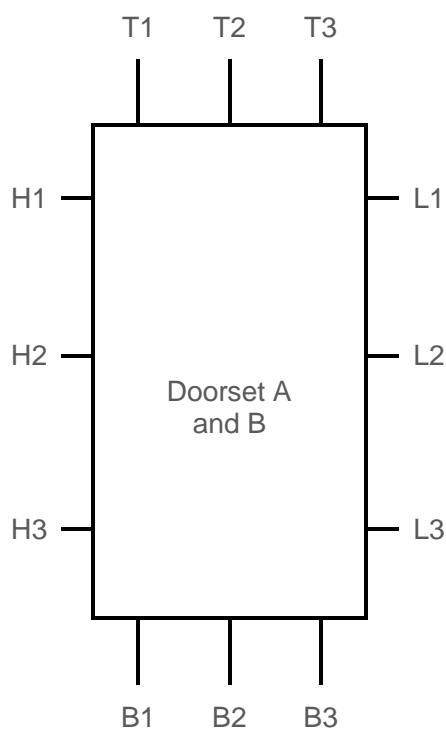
Clearance measurements, Doorset A and B (unexposed side shown)
